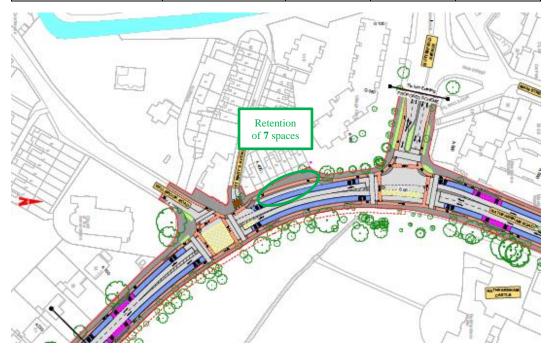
Proposed scheme design on Rathfarnham Road (between St Mary's Avenue and Butterfield Avenue)
